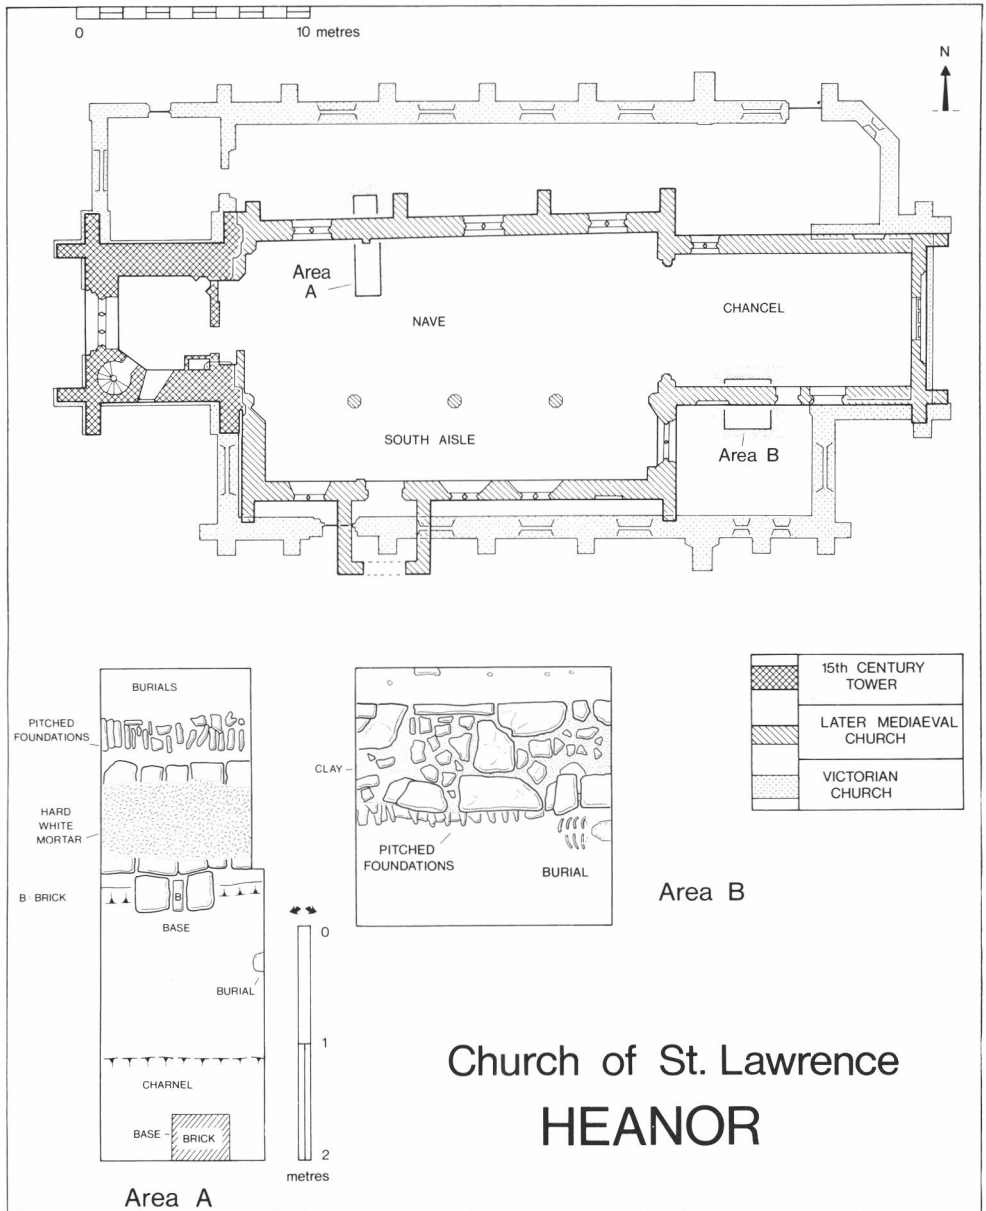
Ground plan of the church of St Lawrence, Heanor, showing excavated areas.
